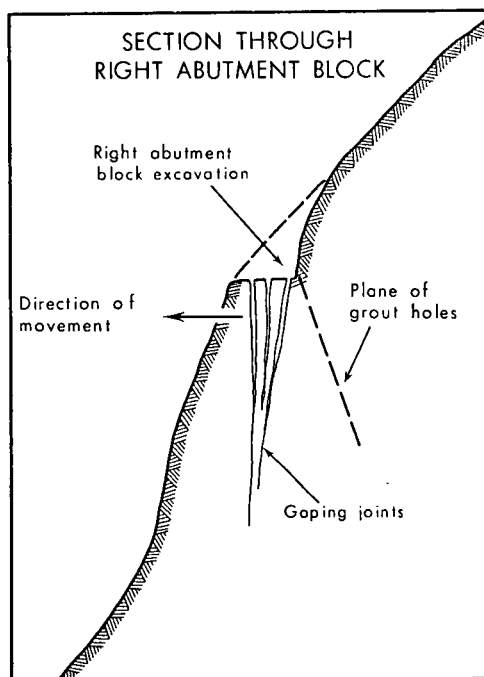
Section through right abutment block showing direction of movement that caused opening up of joints.
